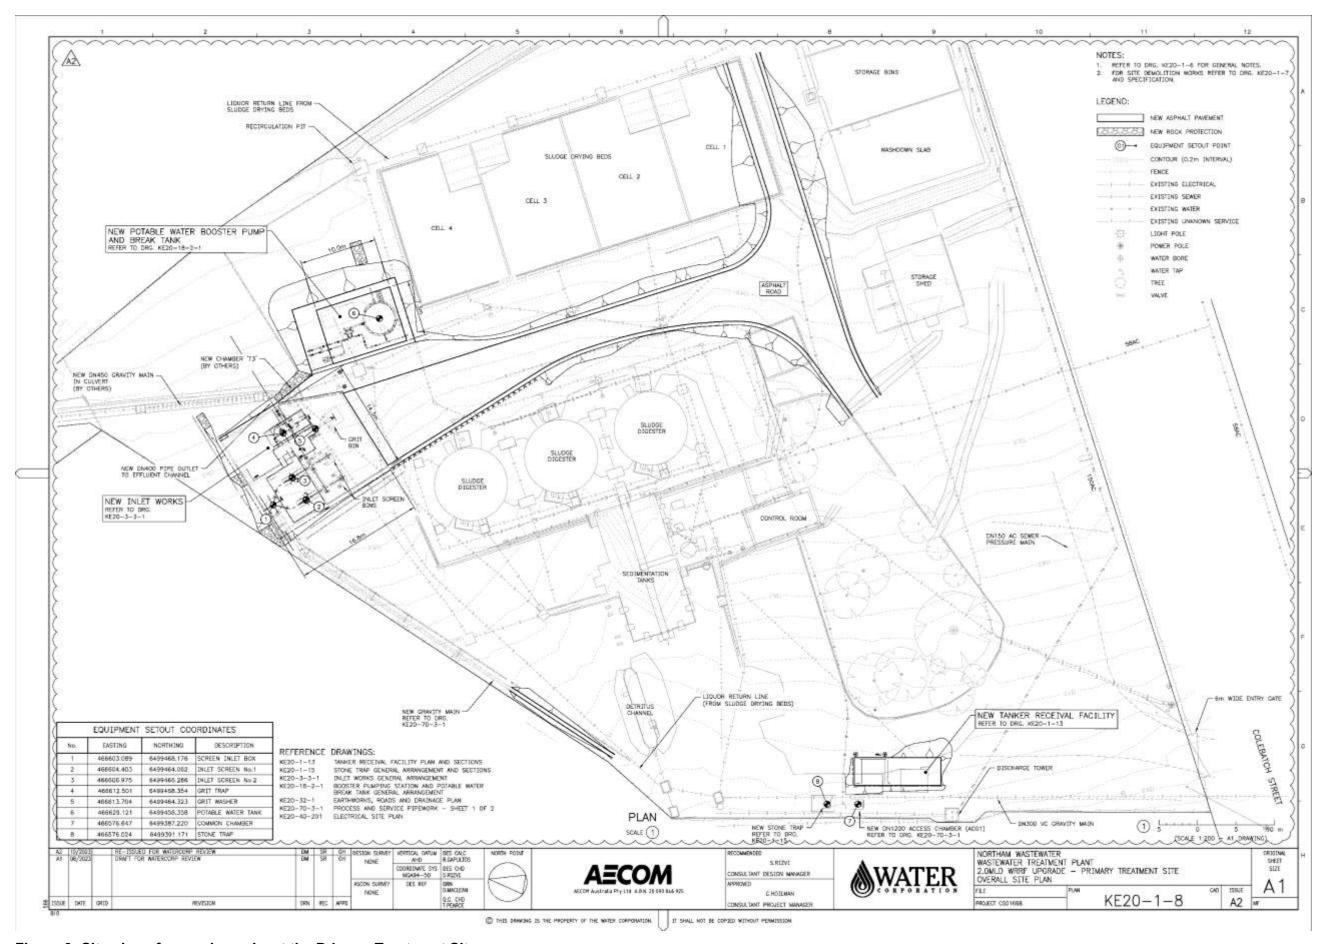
Site plan of upgrade works at the Primary Treatment Site
